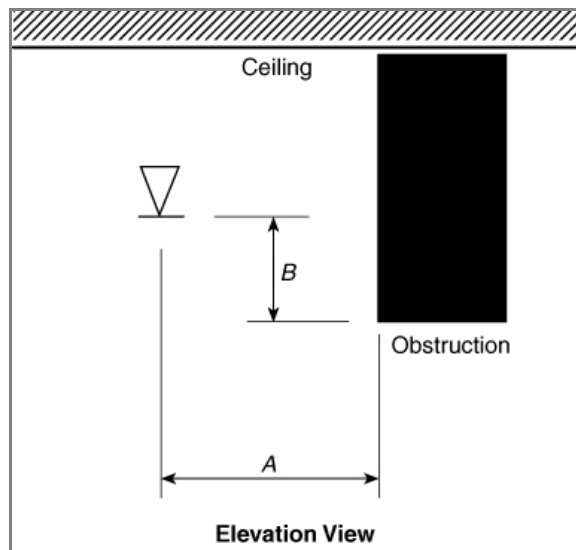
(b) Obstruction Against Wall (SSU/SSP).
